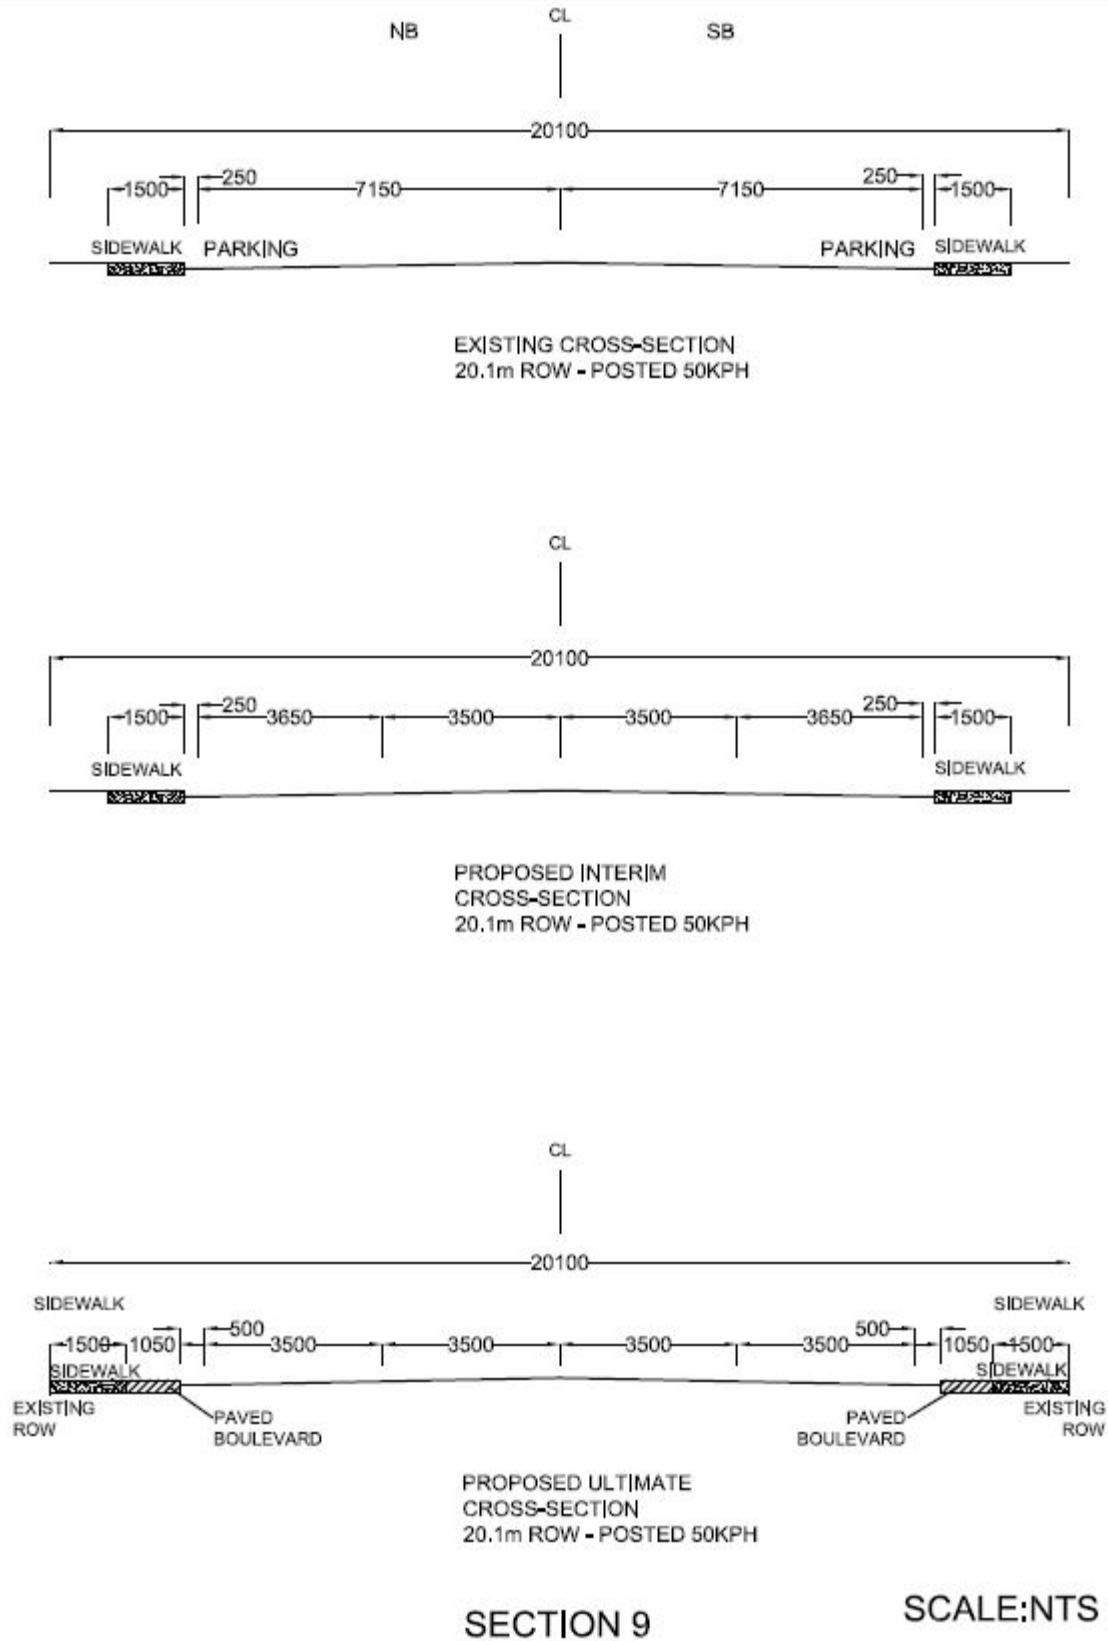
Proposed Section 9 – Hwy 22 South of the Hwy 7 and Hwy 22 Intersection
